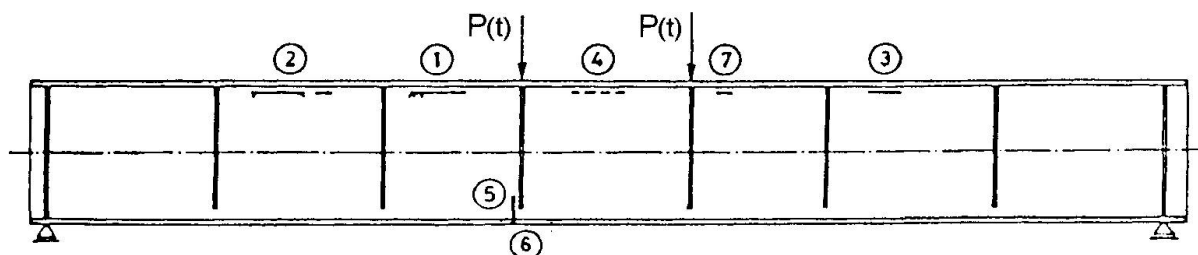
Fatigue cracks in the thin web along welded connections with compression flange and transverse stiffener, crack in tension flange.
